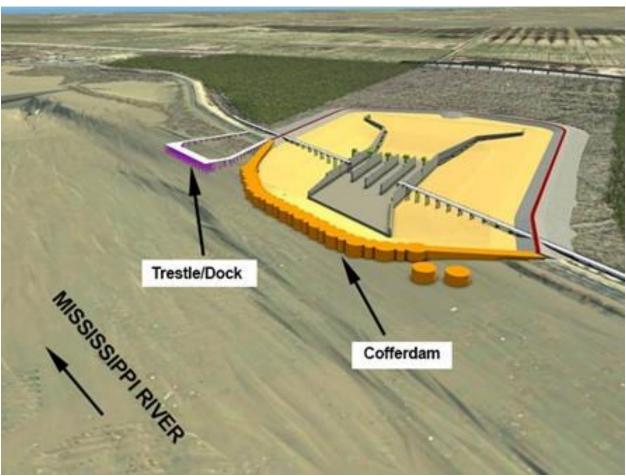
Proposed Trestle and Construction Cofferdam Overview
